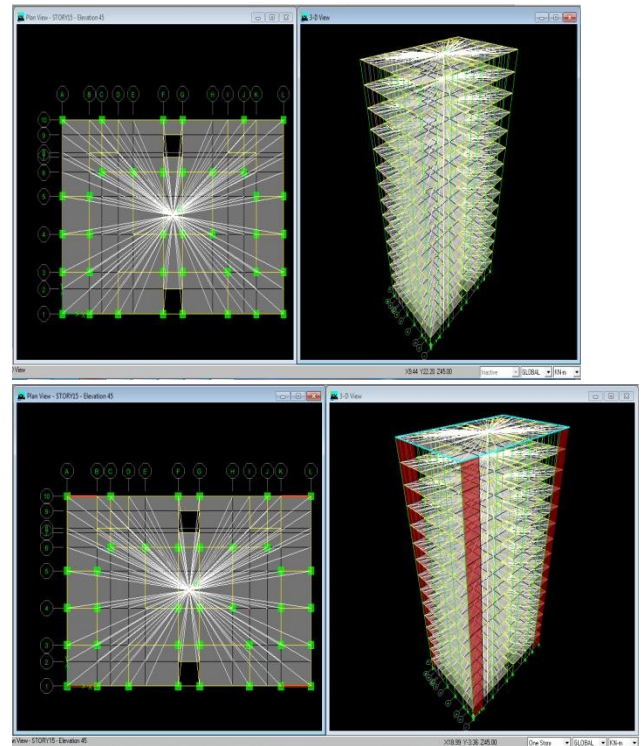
Building with 0% Shear wall opening Fig 2.2
